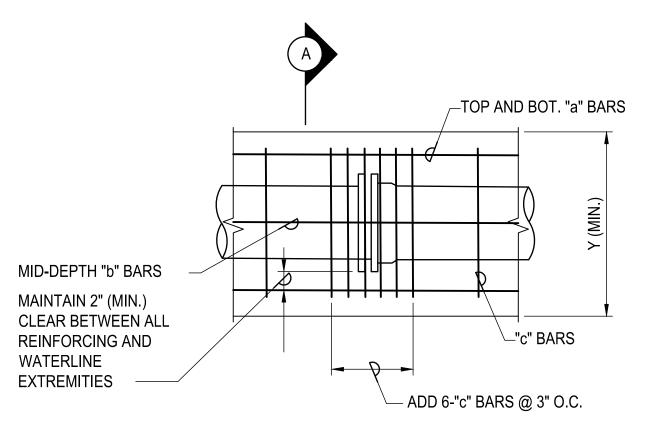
DETAIL - WATERLINE OFFSET AT DRAINLINE CROSSING SCALE: 1/2" = 1 FT.
